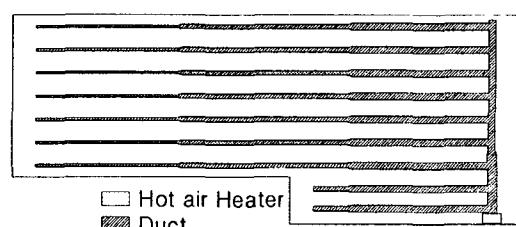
Arrangement plan of hot-air heater with blower ventilative type in declared greenhouse
